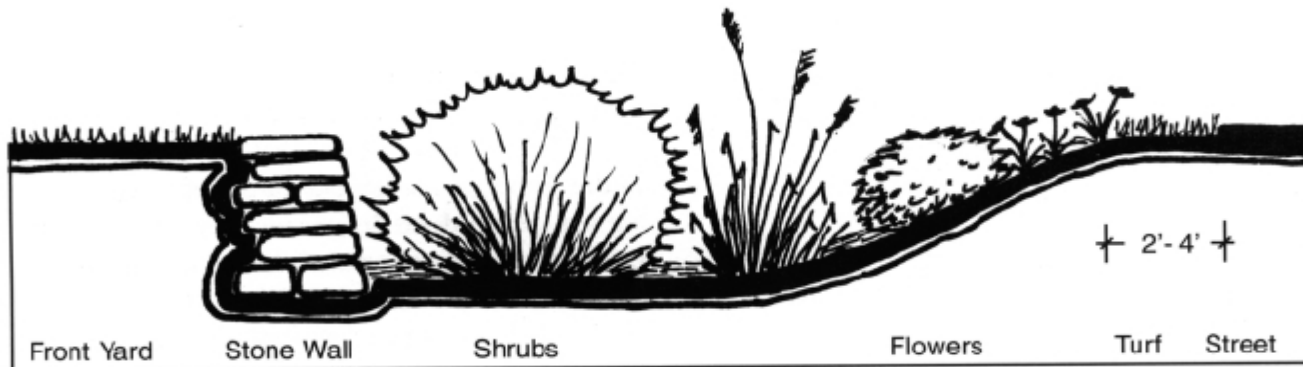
High-Volume, Asymmetrical Rainwater Garden with Masonry Wall
